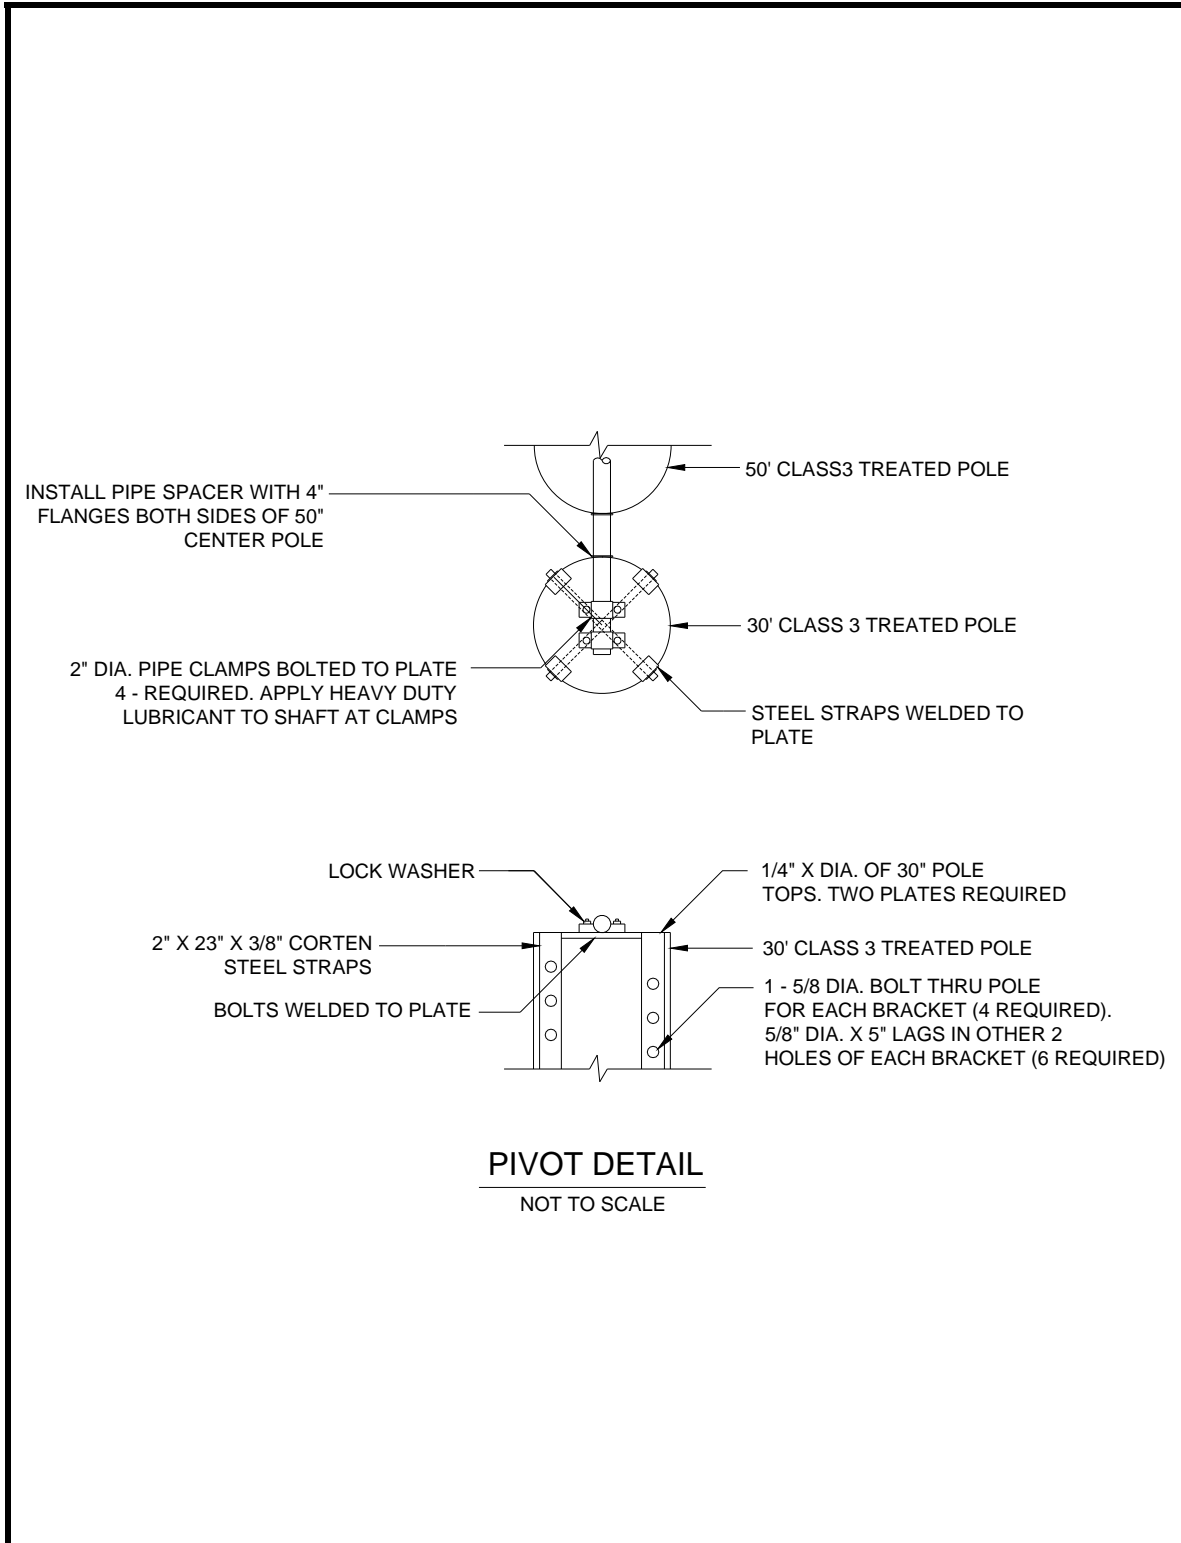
Standard Details for Pivoting Rotating Beacon Pole – Pivot Detail.
